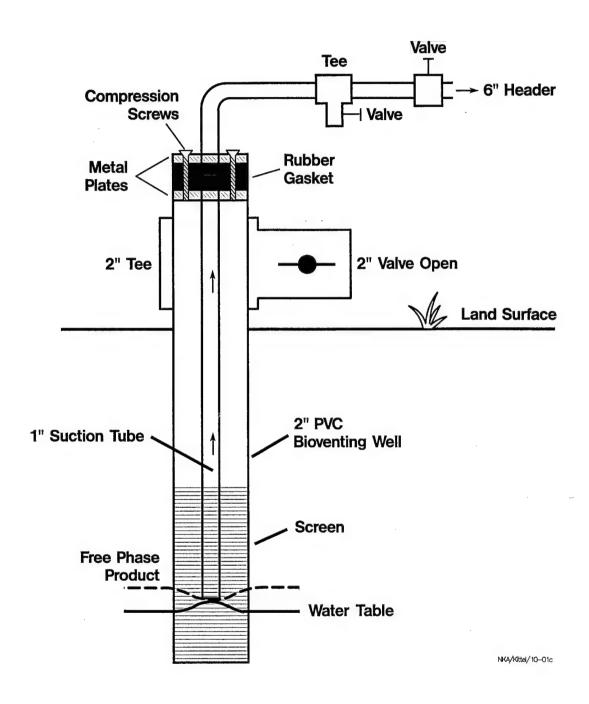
Slurper Tube Placement and Valve Position for the Skimmer Pump Test
